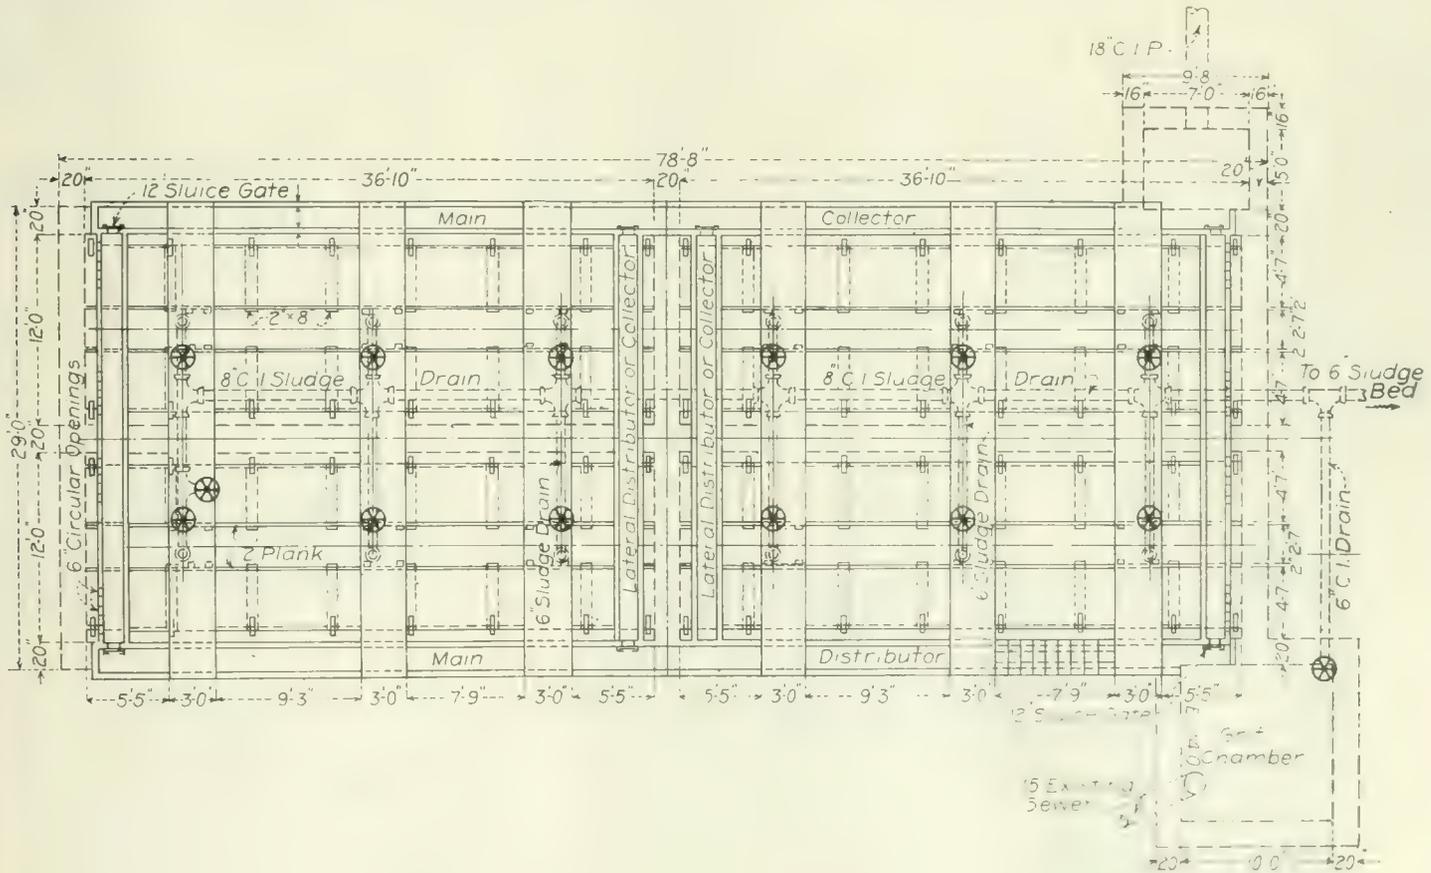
Plan of Septic Tank at Moorestown, N. J., as Converted Into a Modern Two-story Tank.
